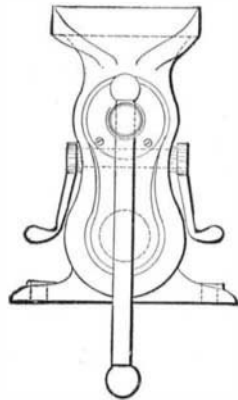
End View of the Vise, showing the Disengaging Handles.
